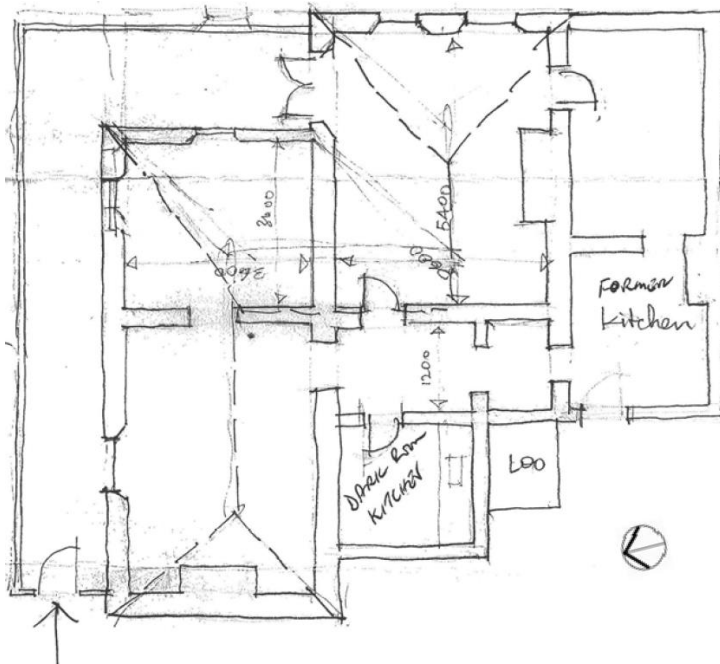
Plan of the Messenger's Cottage drawn by architect Don Ellsmore on 16 November 1978. (Source: TKD 2016: Fig 43).
